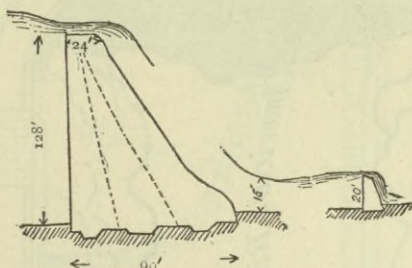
CROSS-SECTION OF TURLOCK DAM.
